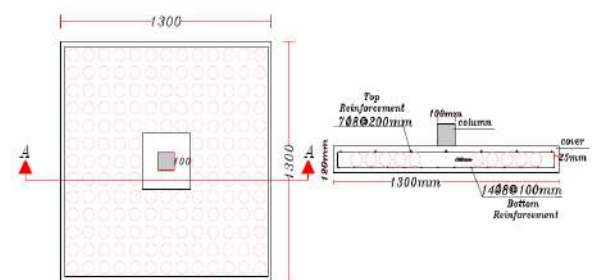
Implementation details of the balls in the S_1 void slab specimen (dimensions in mm)
